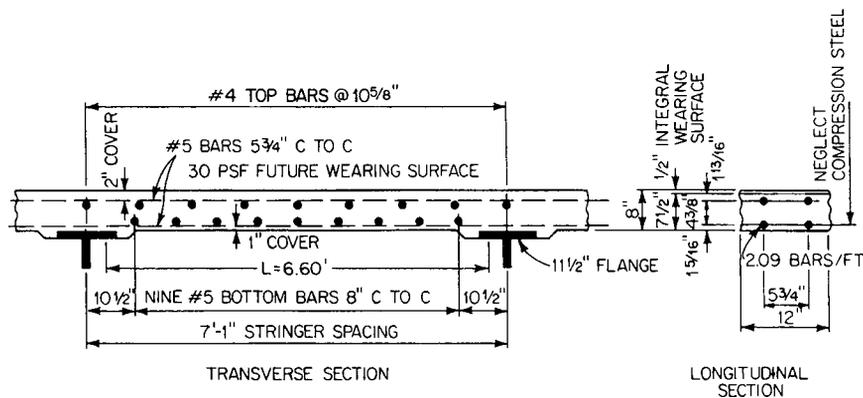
Concrete deck of tied-arch Glenfield Bridge (Fig. 14.18) is supported on steel stringers. (Current AASHTO Specifications require that concrete cover over top reinforcing steel be at least 2 1/2 in instead of the 2 in used for the Glenfield Bridge.)
